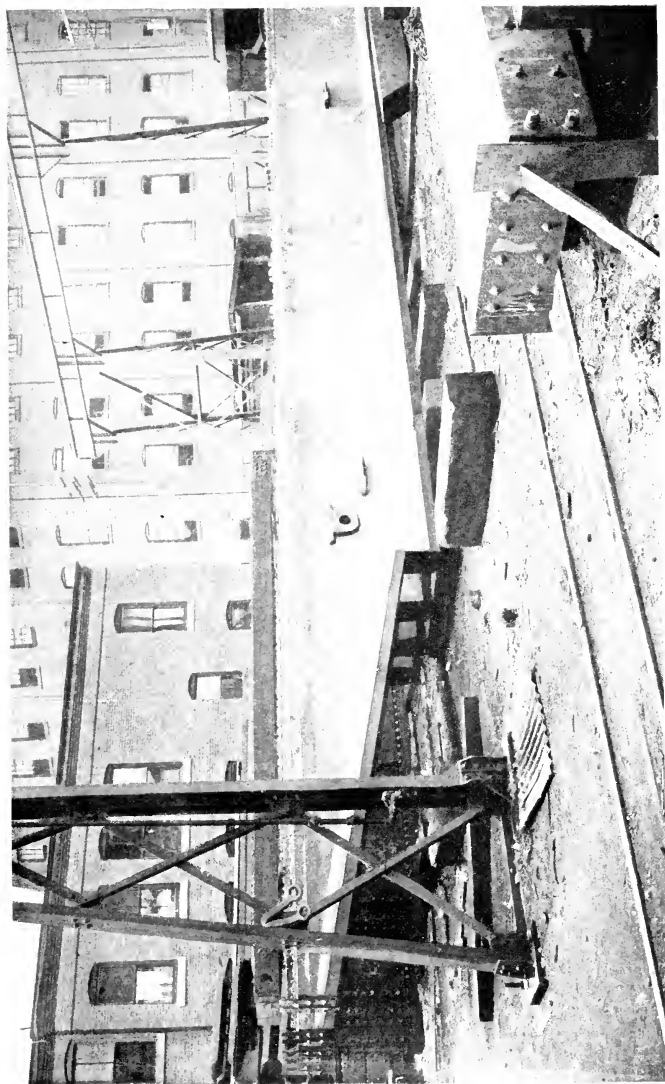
BOYLSTON STREET BRIDGE NEW CITY FLOOR BEAM WITH CONCRETE PROTECTION COMPLETED
